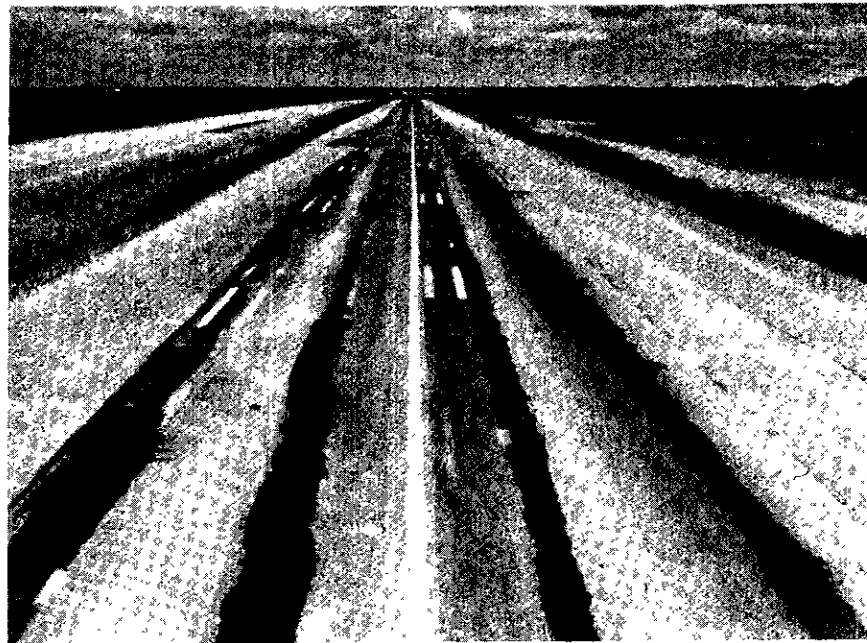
Water standing in ruts — asphalt concrete pavement; AASHO Road Test (Ref. (27)).
